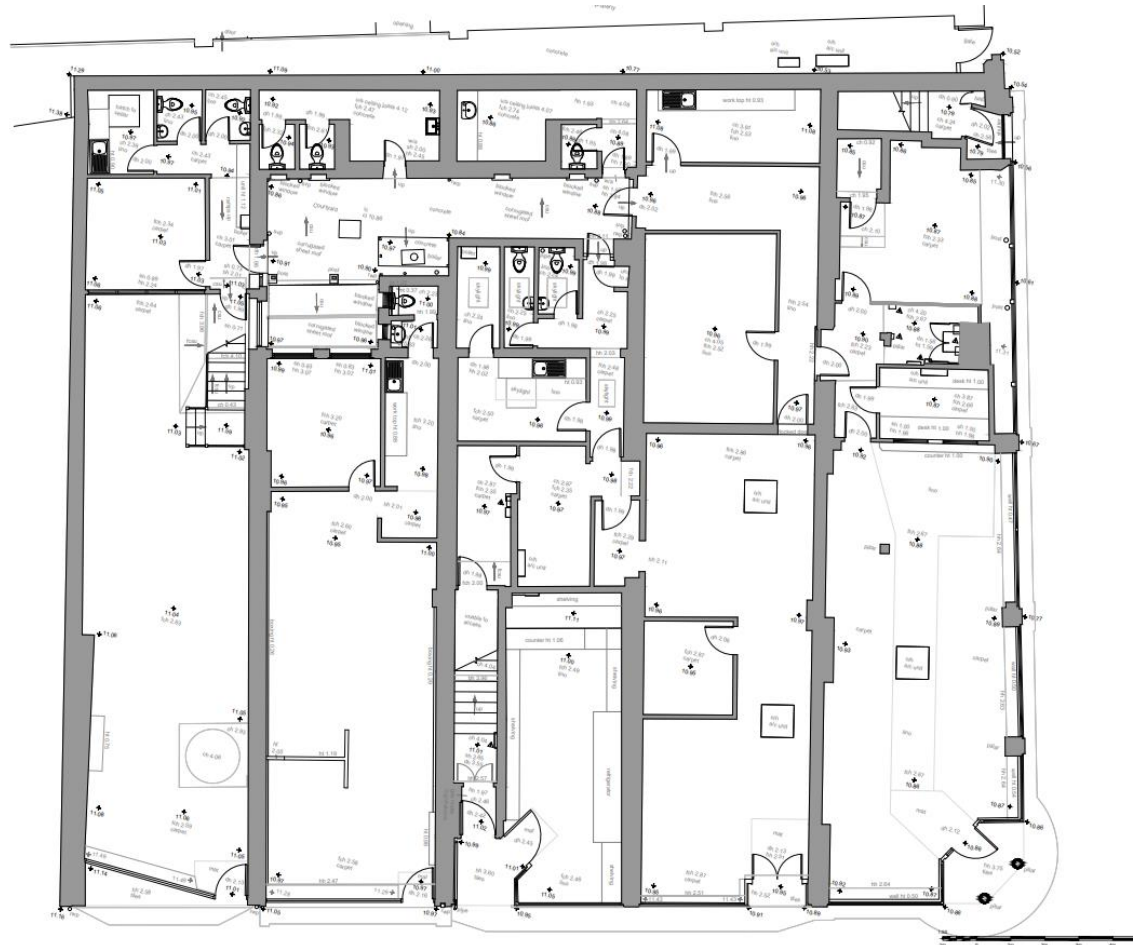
Existing Plan of the Ground Floor (reproduced courtesy of the client).
